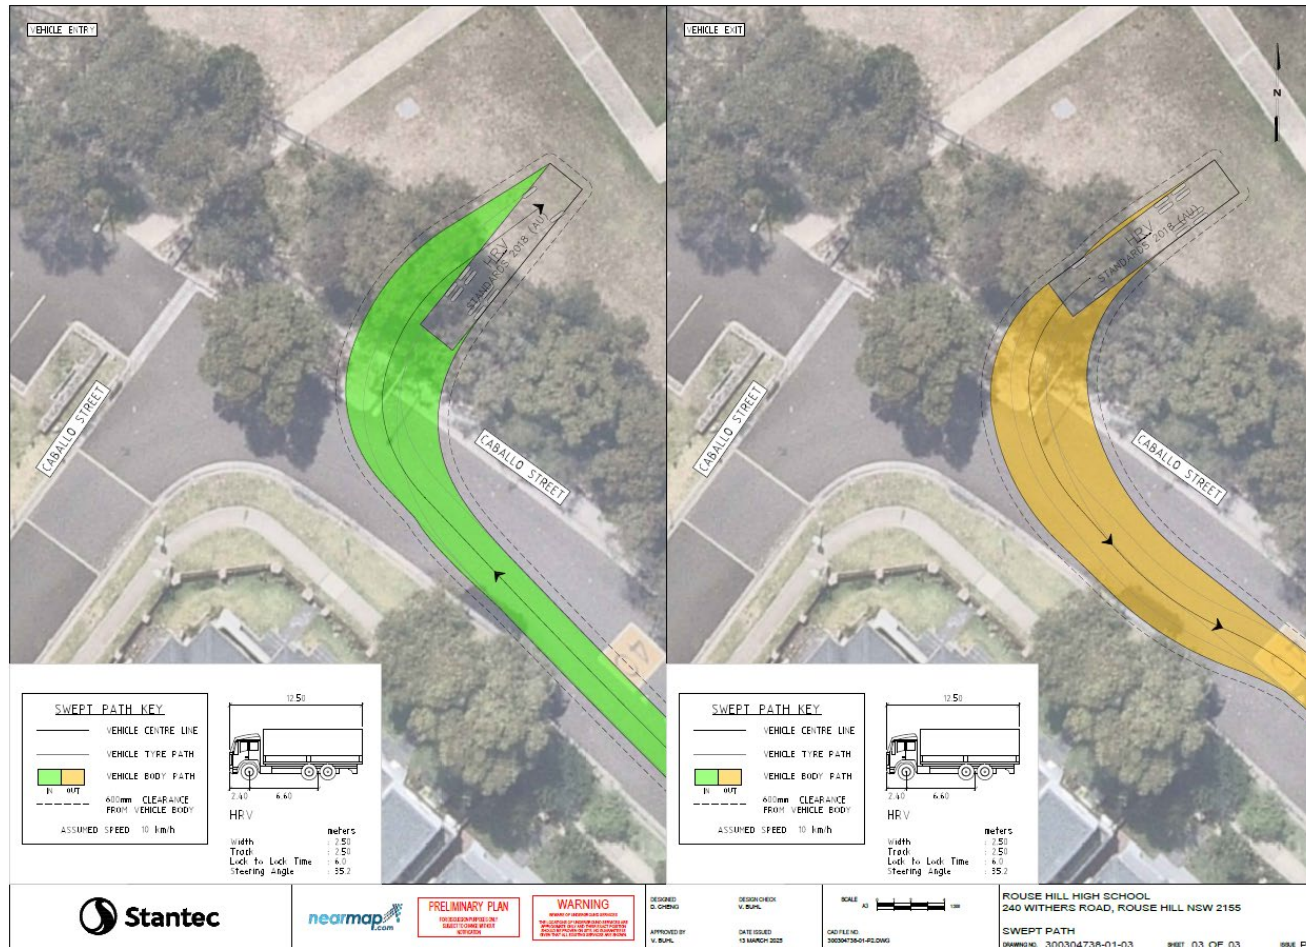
Construction heavy vehicle swept paths at construction site access point
